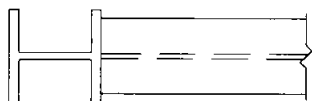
Detail of frame showing orientation of beam-to-column connection (plan).
